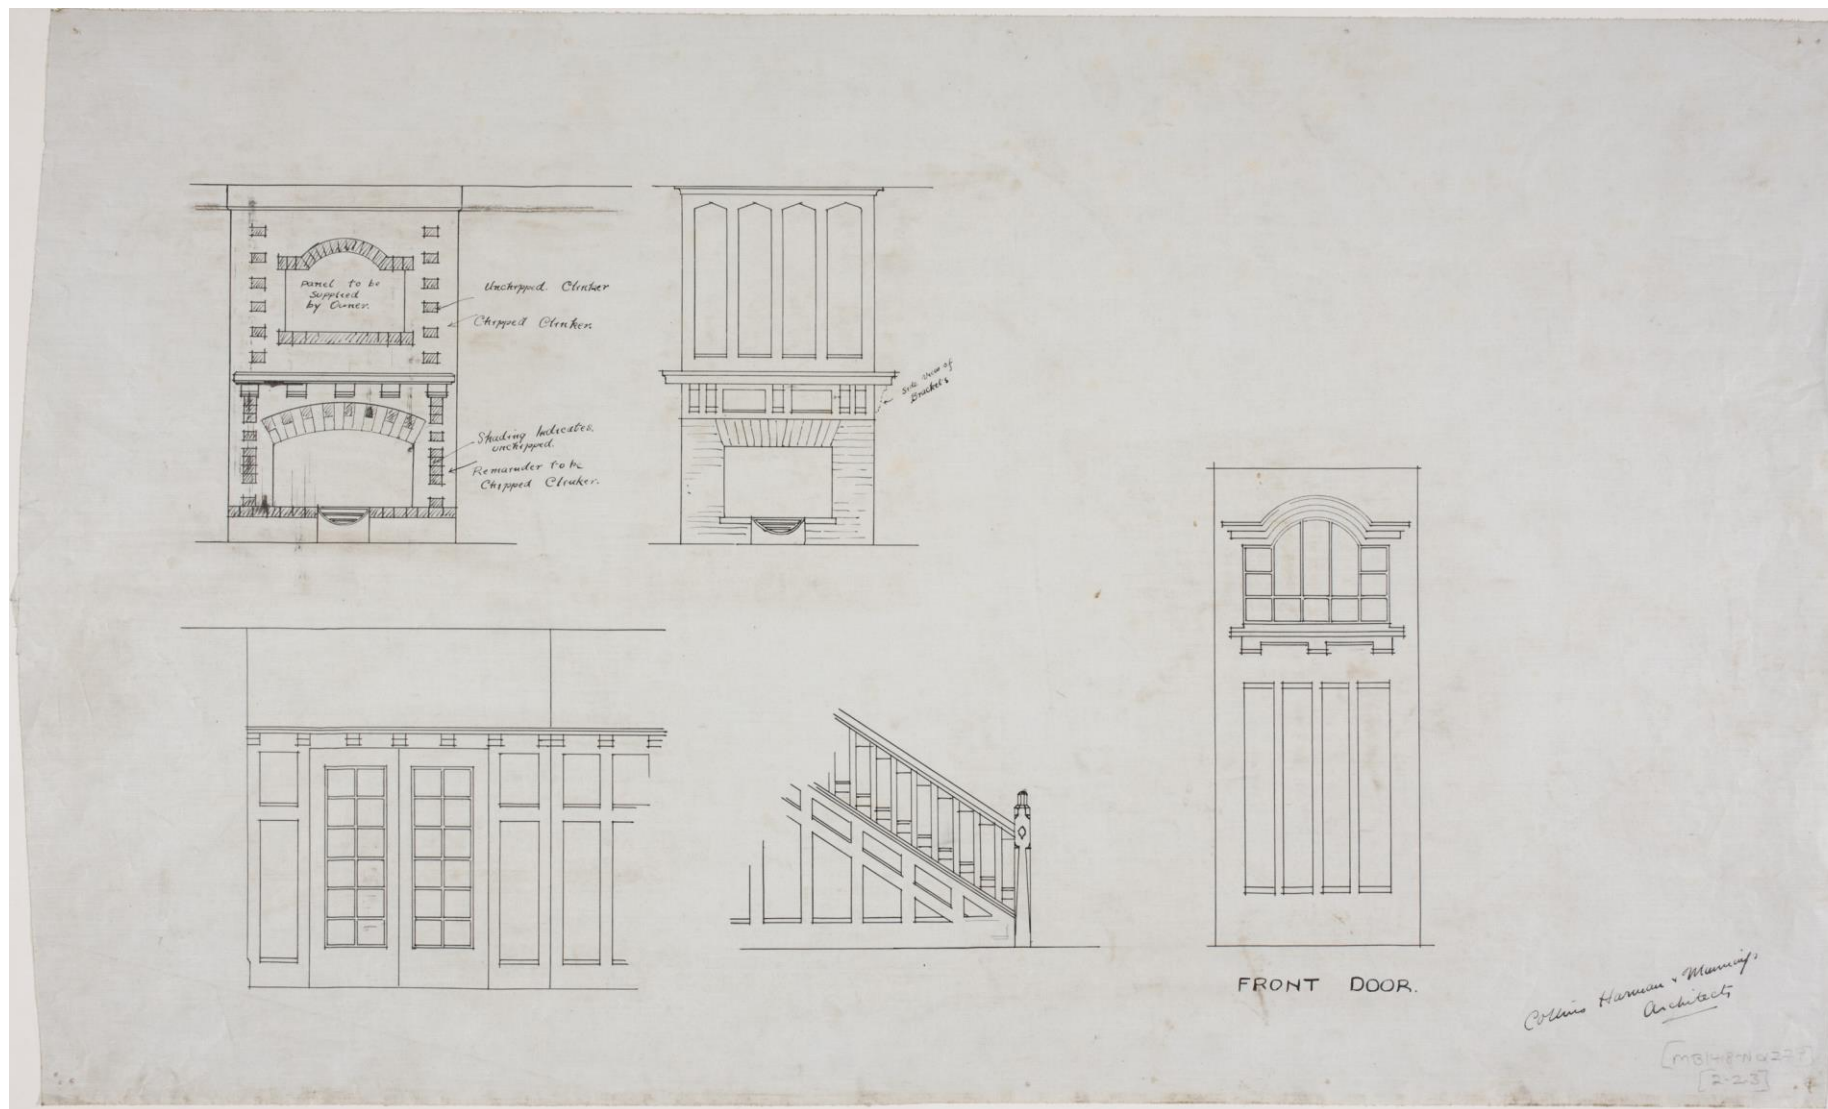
Collins, Harman and Munnings, Bates house, 43 Holmwood Road, details (1919).
